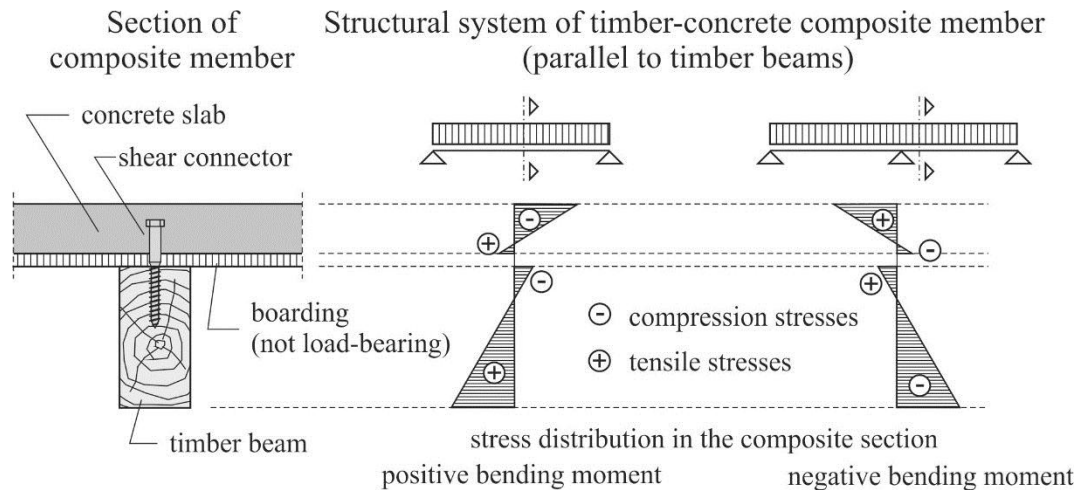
Strengthening of existing timber beam ceilings with TCC [18]
